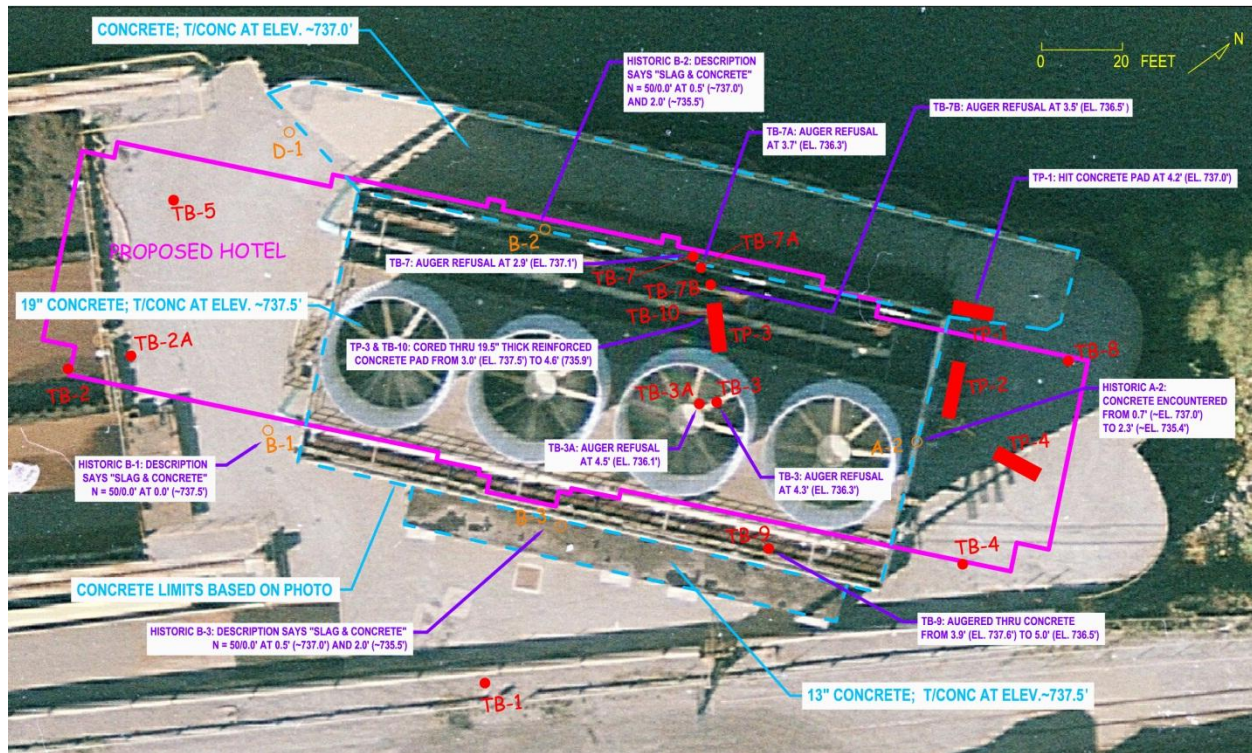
Site map showing test borings, existing mat foundation, hotel footprint, and location of former cooling towers.
